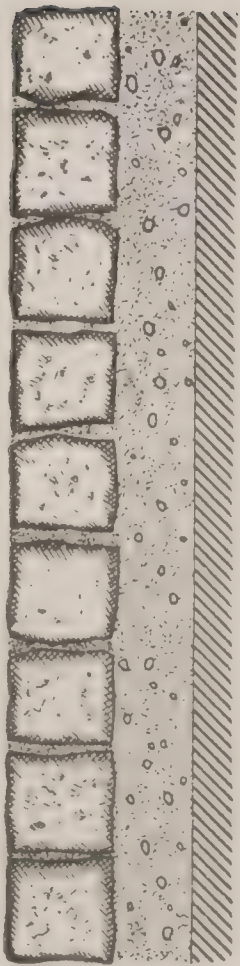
BELGIAN BLOCK PAVEMENT.
